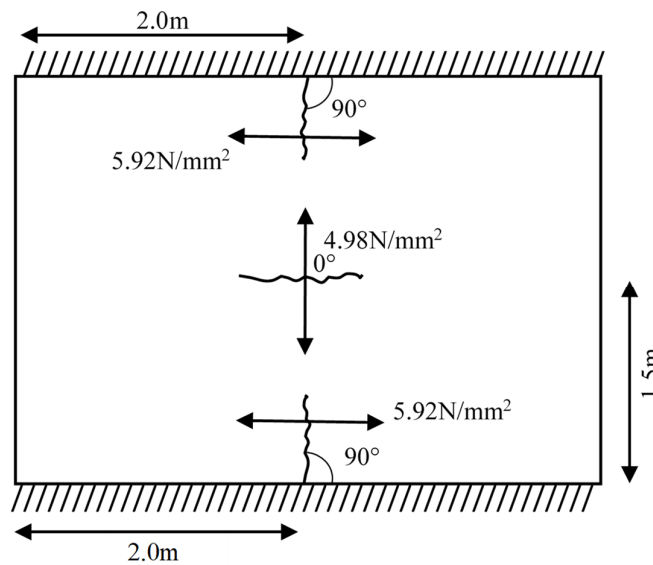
Observed possible crack pattern - 4m wall with top and bottom restraints
